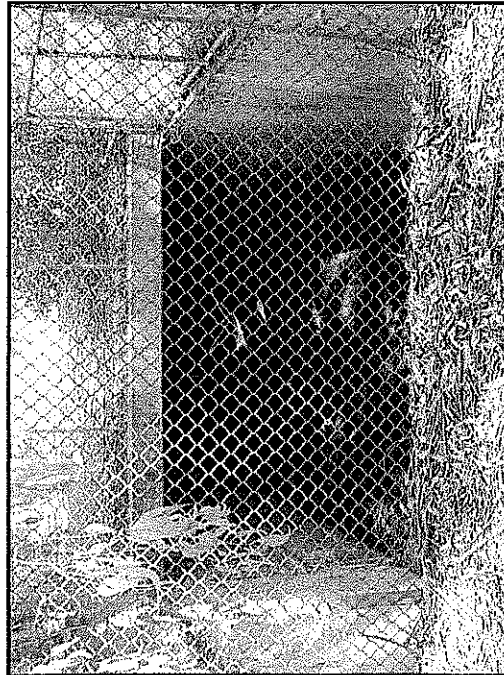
Lindero Canyon Creek box culvert "daylight" location within project site.
